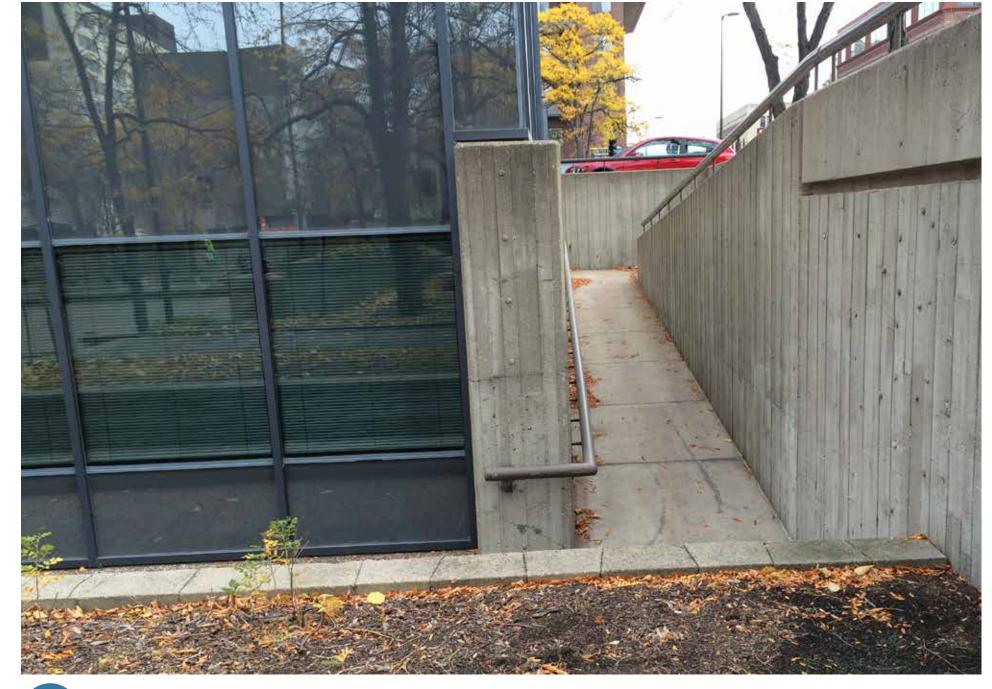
IMAGE 'A' - LOOKING EAST AT EXISTING RAMP
